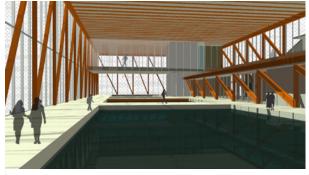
Interior View of Pool Deck showing exposed vierendeel trusses
